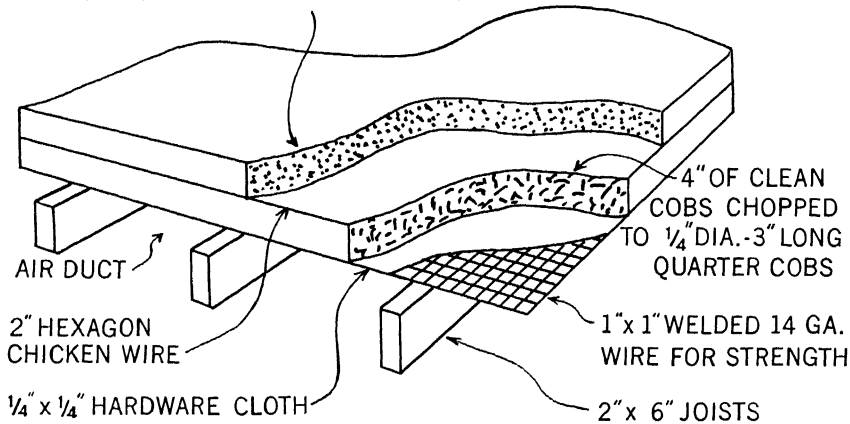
This drawing shows the arrangement of air ducts, floor and litter components used.
